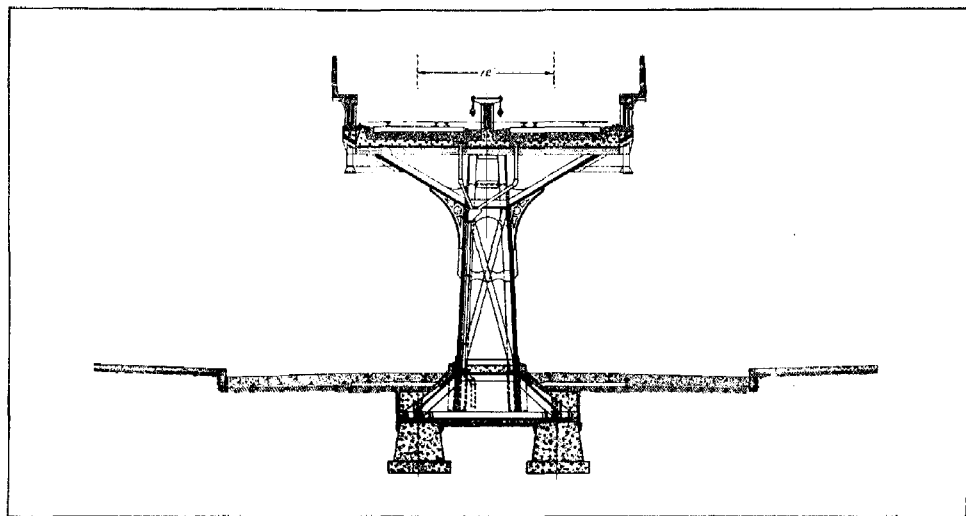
Single column ballasted deck elevated railroad—cross-section between stations (Philadelphia type).
